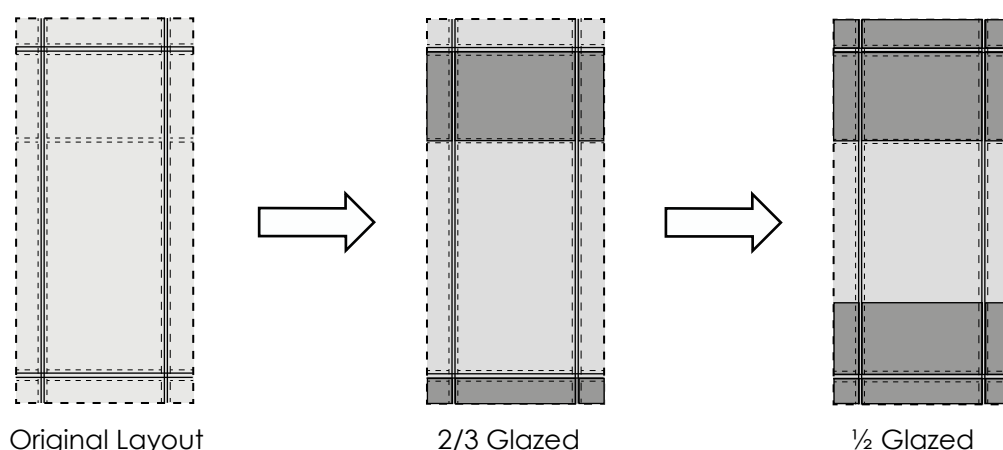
Amendment to layout of façade unit from fully glazed to 2/3 glazed to 1/2 glazed façade unit (source: own image)
